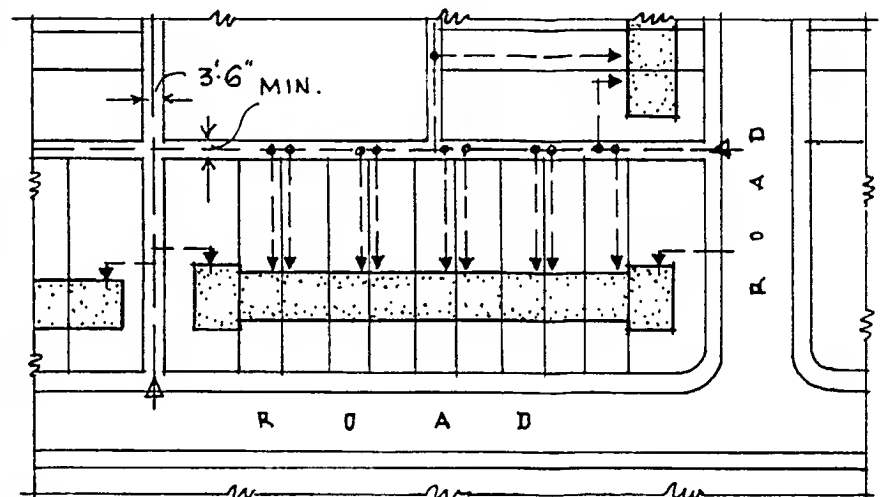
diagram A illustrates normal through-passageways between pairs of houses over which the first floor is generally carried; these passageways should not be less than 3ft. 6in. wide. Gates should be provided at the entrance to each back garden.
